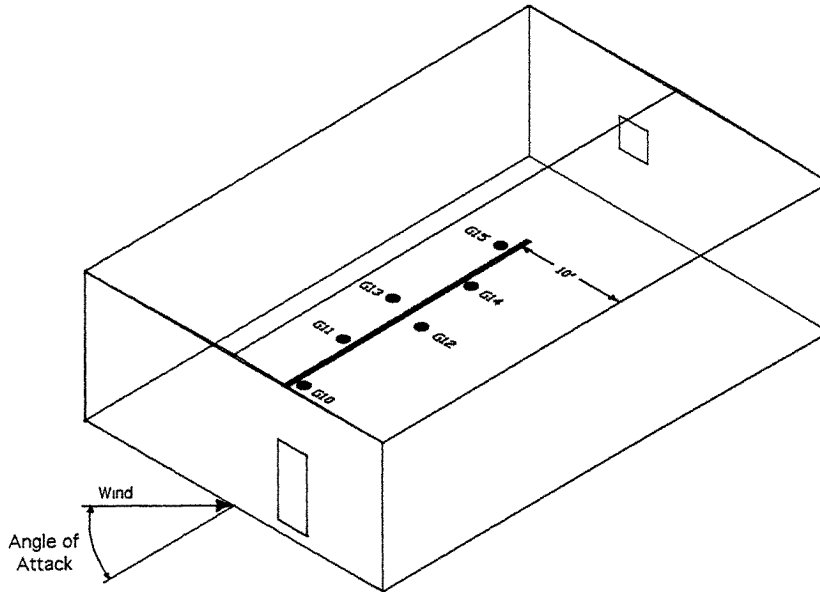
Test building showing opening locations and location of the instrumented purlin and pressure transducers used in the area averaging experiment.
